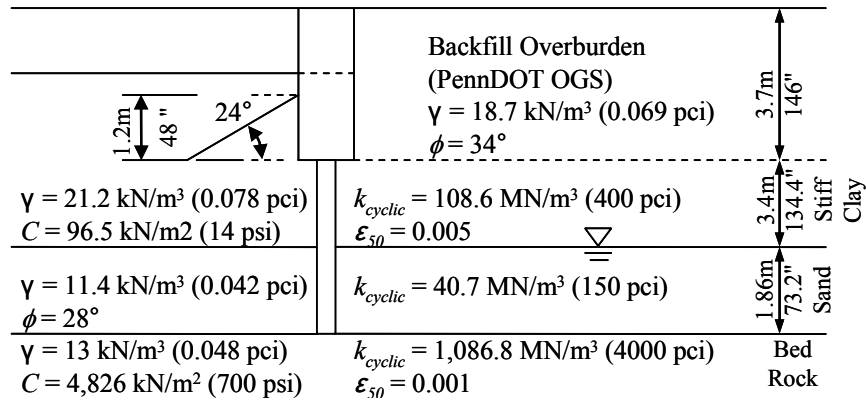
Bridge 222 Soil Properties under Abutment 1
